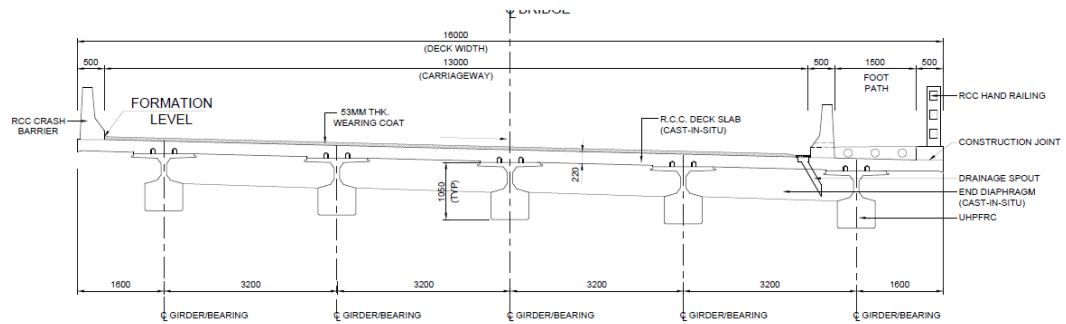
22 Cross section of 25m span UHPFRC post tensioned I girder at support
